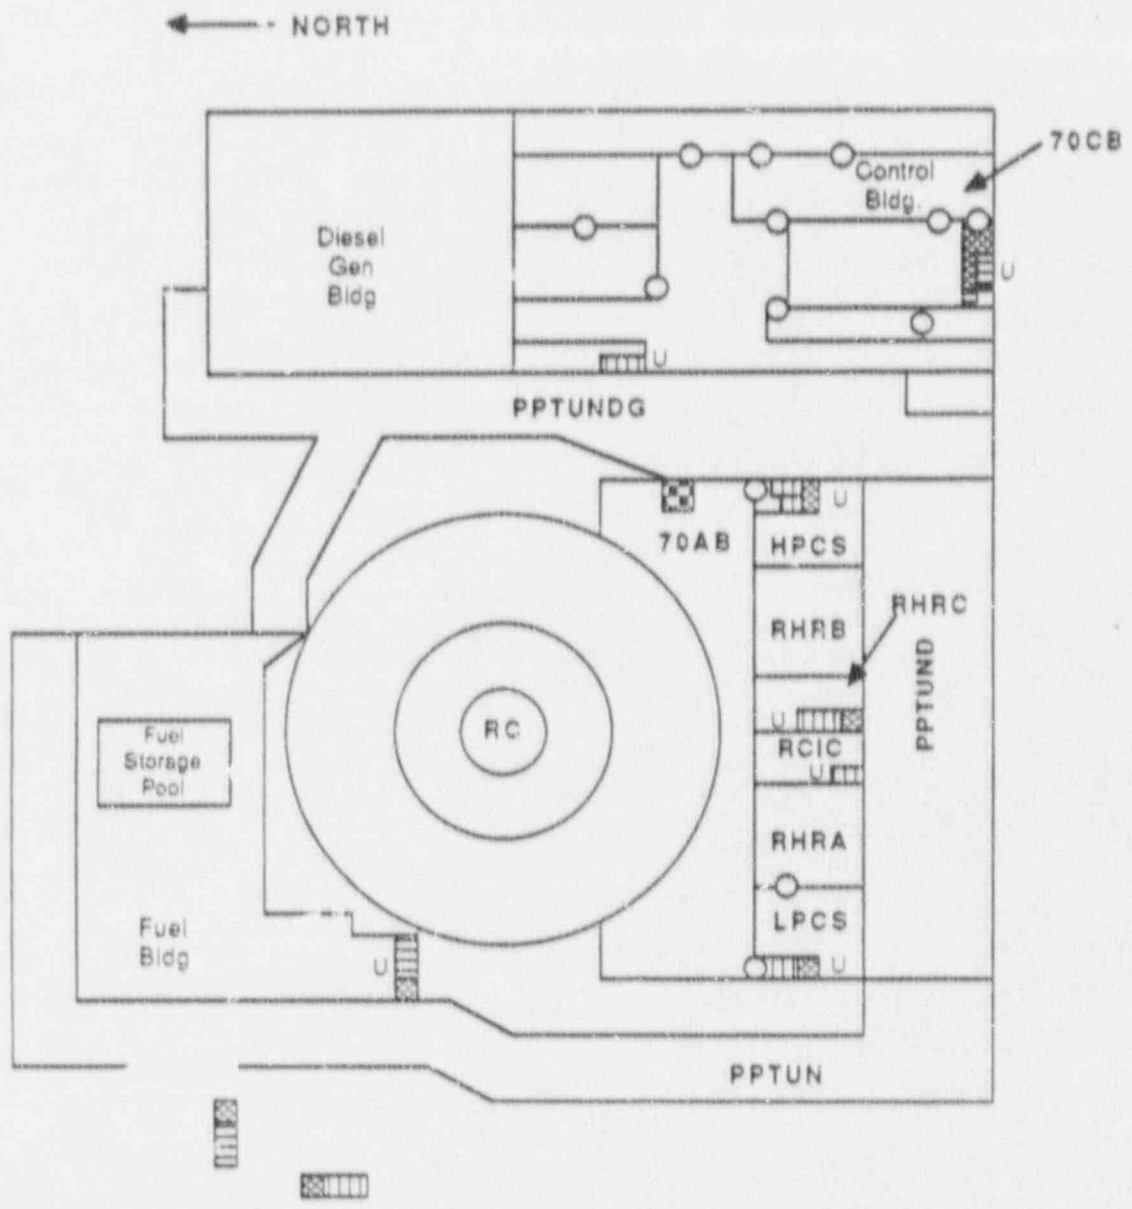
River Bend 1 Station Arrangement, Elevation 70'
